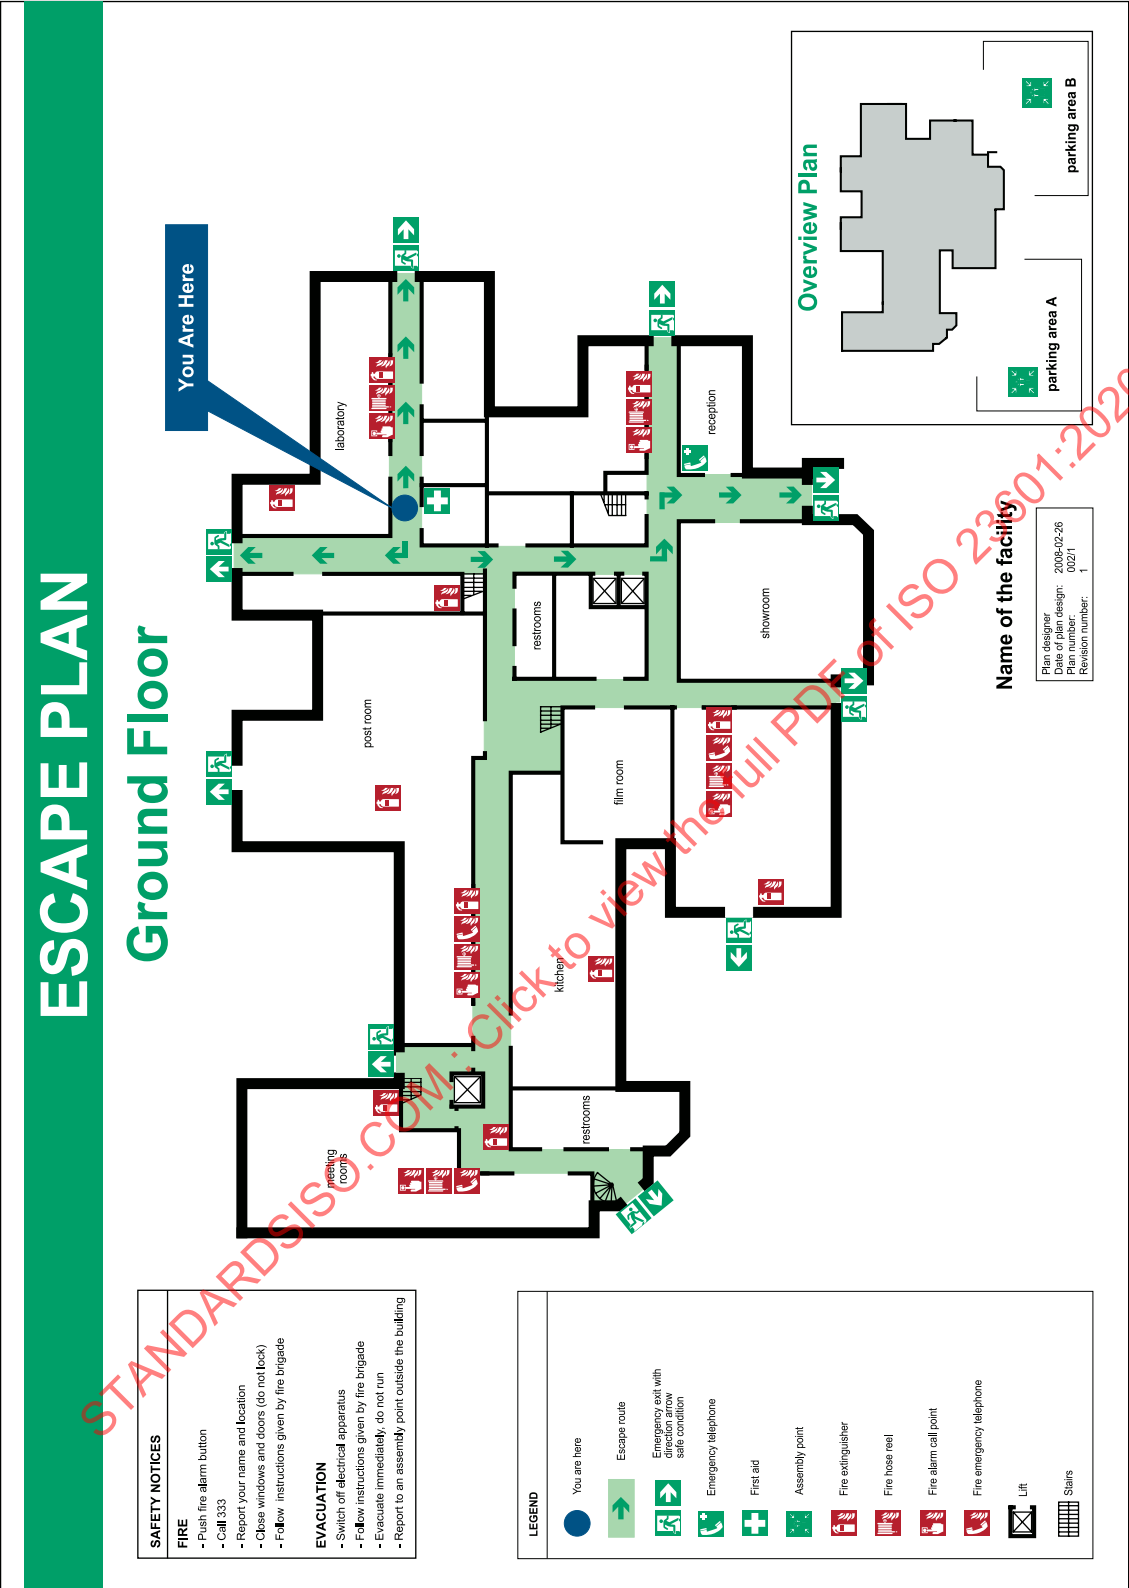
Example of an escape plan with directional arrows — Complete floor
